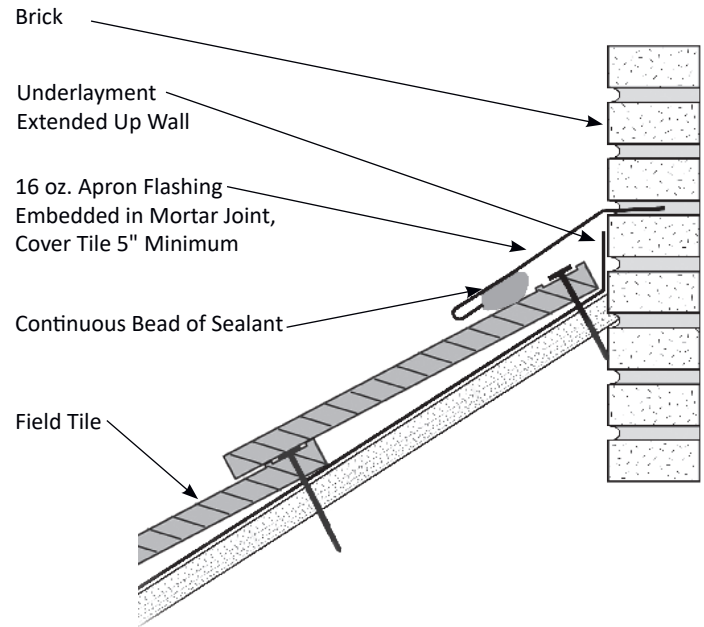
Apron Flashing at Brick Head Wall Detail
